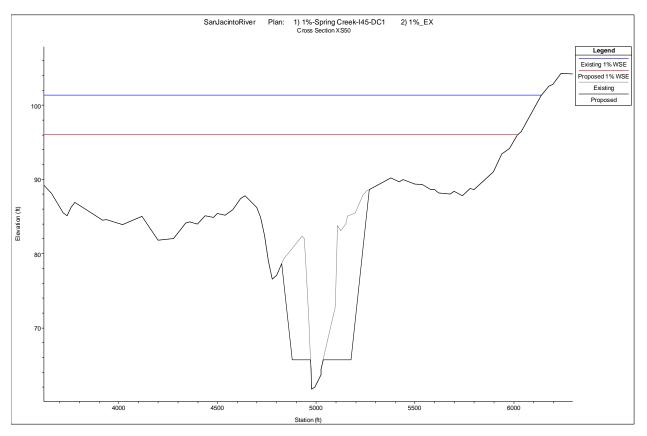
Cross Section—Interstate 45 Channel Improvement on Spring Creek
